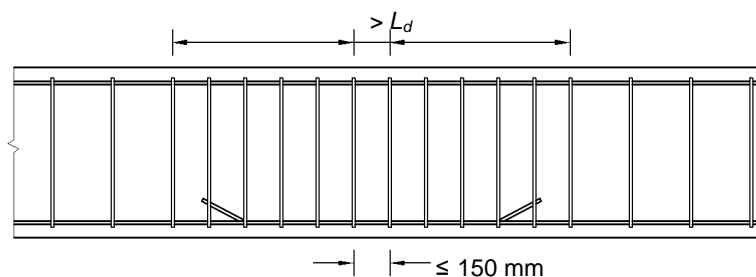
LAP LENGTH AT LOCATION OF SPLICING OF LONGITUDINAL BARS IN BEAM
